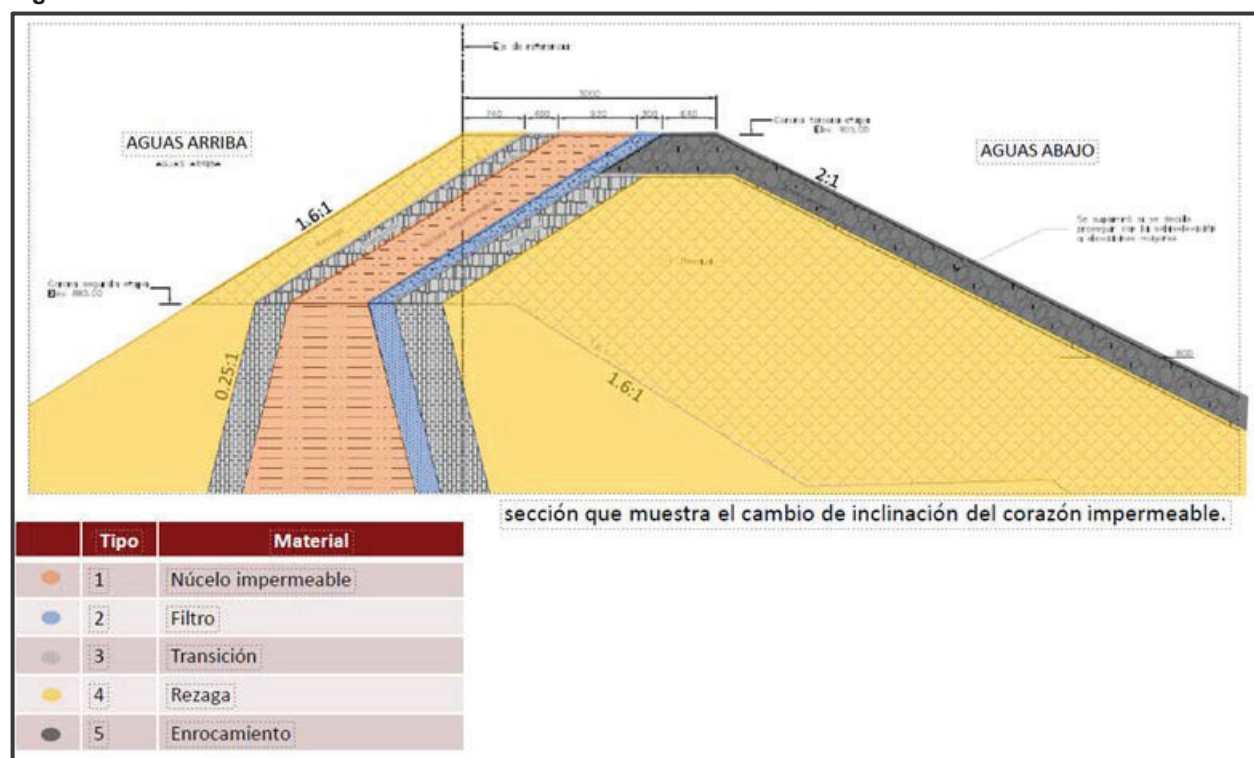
Typical La Caridad TSF No. 7 Embankment Cross Section
